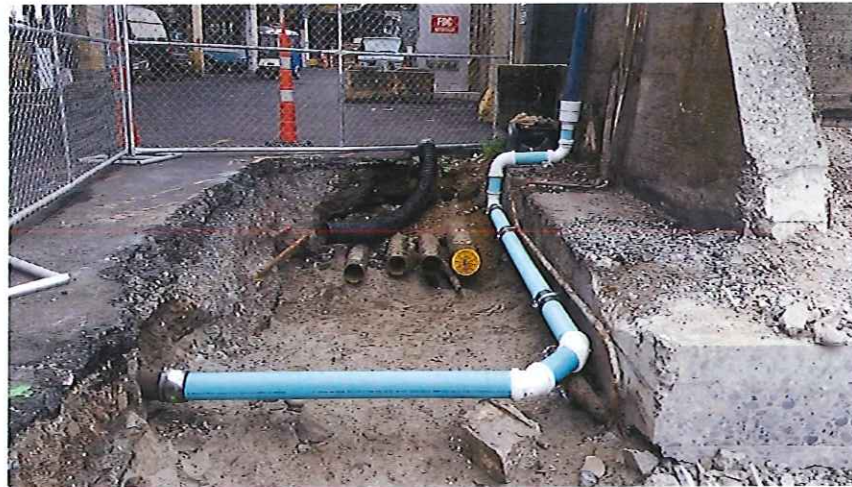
LOOKING WEST AT THE SOUTHEAST CORNER OF BUILDING M-28
